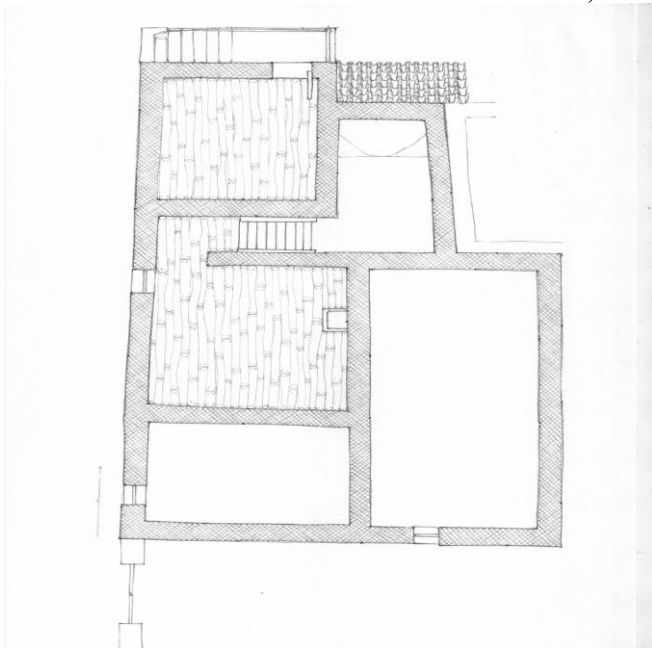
Draw of the first floor of a two levels house, Picote, Drawn by Joana Diogo.
